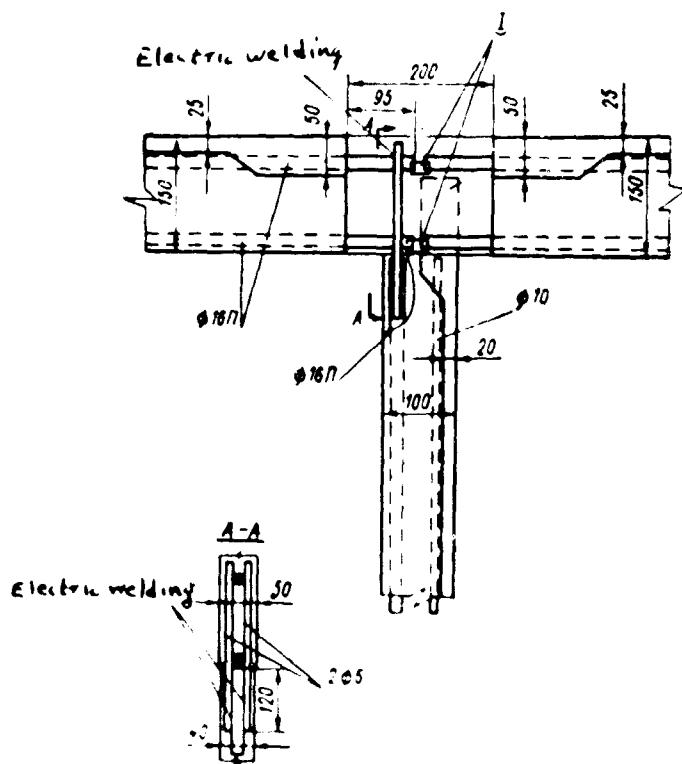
Connecting the ribs of the Longitudinal Bulkhead with the Beams.
